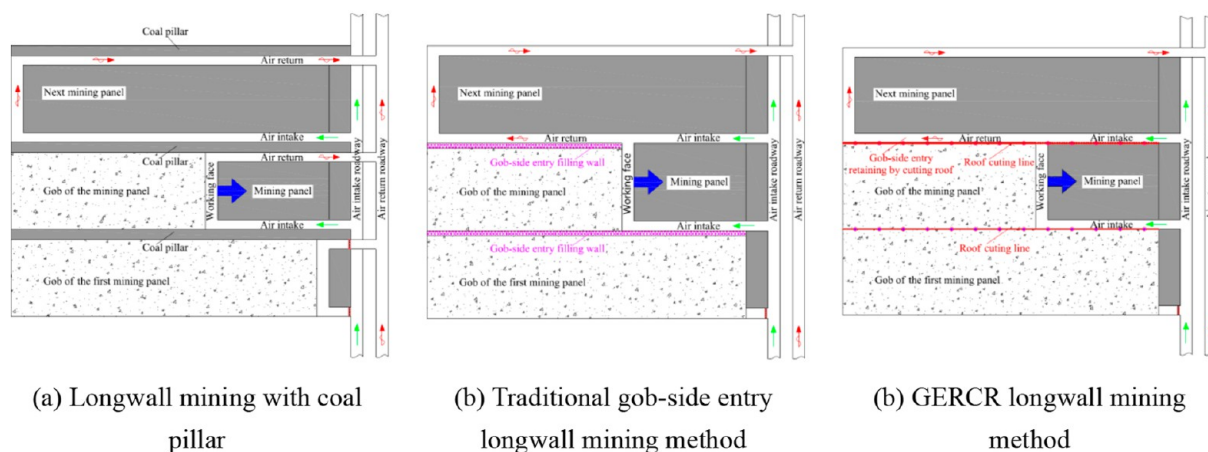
(a–c) Longwall mining methods with coal pillar and without coal pillar.
